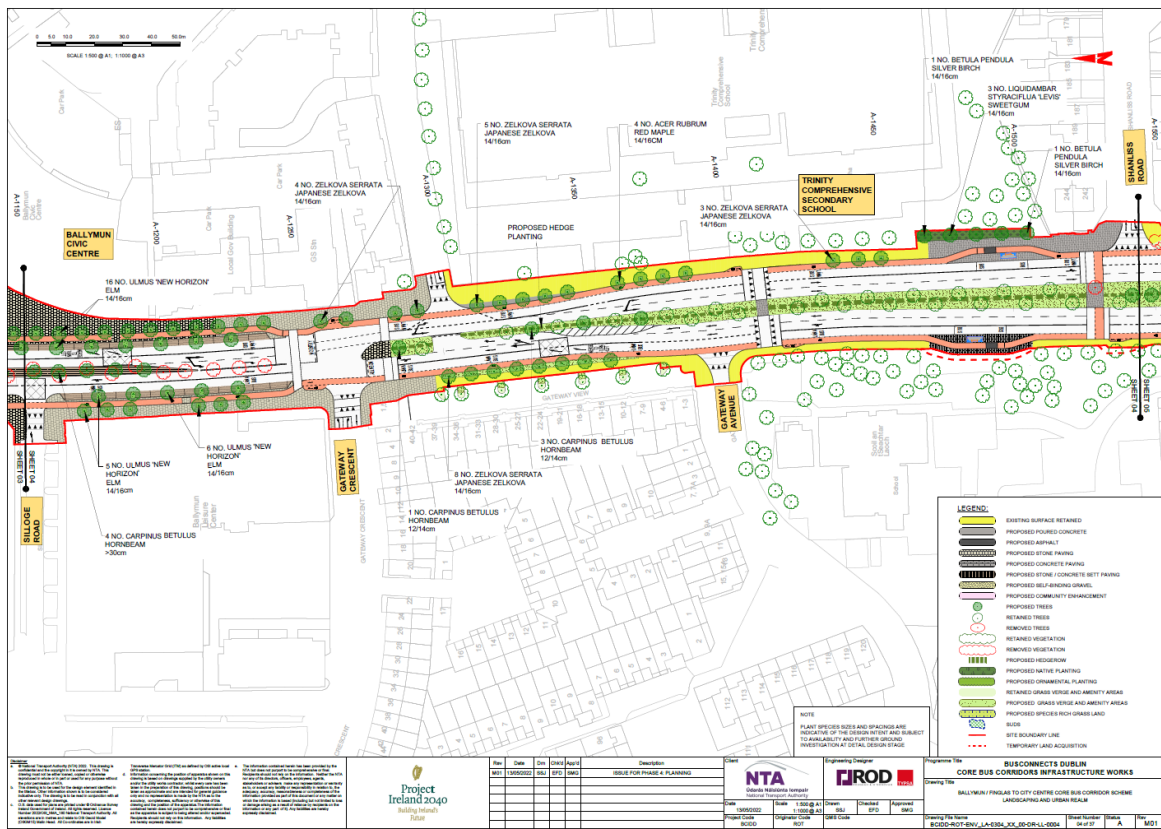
Landscape General Arrangement Drawing Sheet 4 at Ballymun
